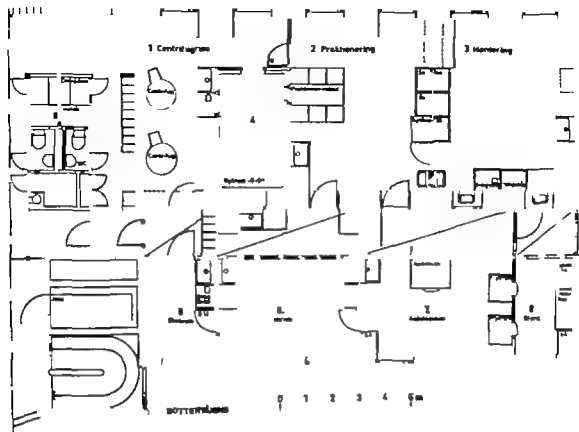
Floor plan the new pilot plant laboratory for cold fractionation
